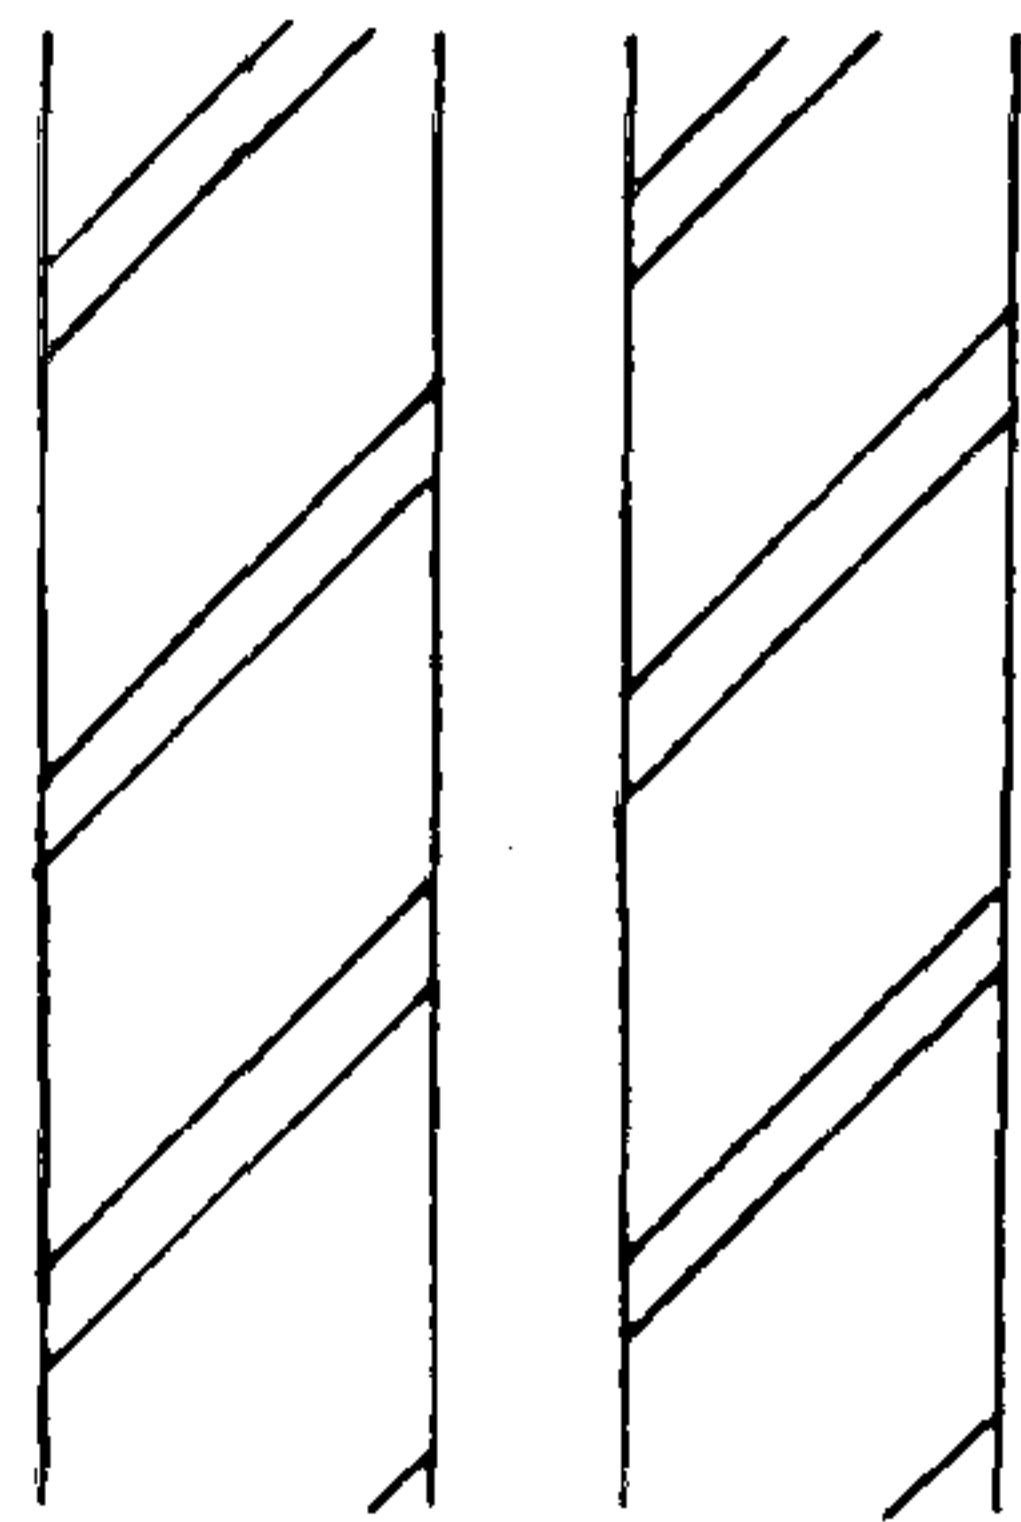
CAVITY BRICK WALL. UNGLAZED
